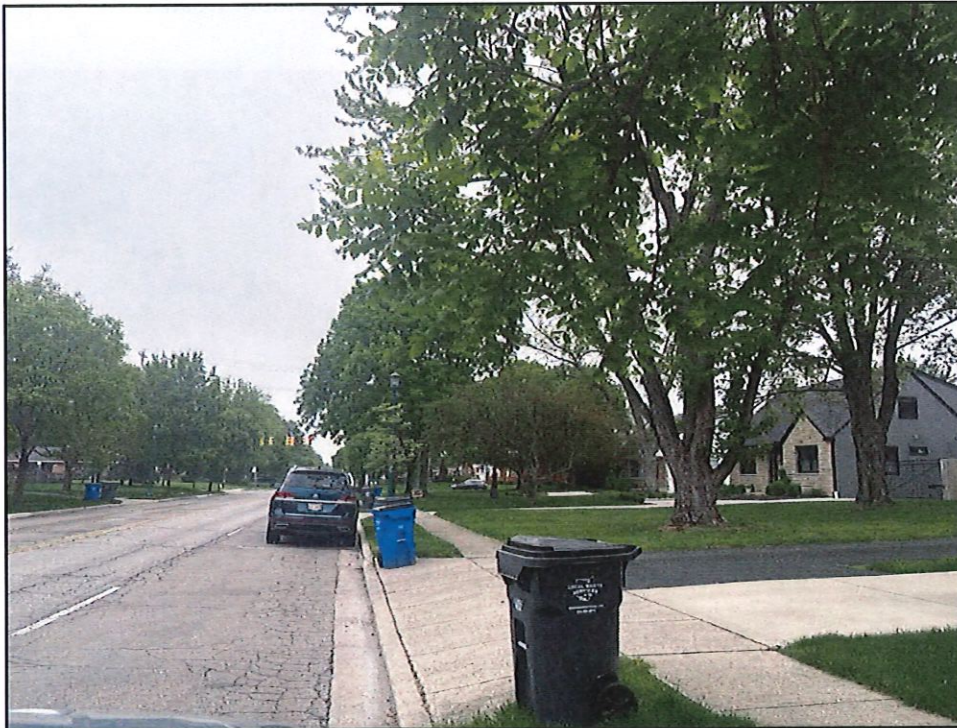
View of representative Road Right of way along Northwest Boulevard, facing north.
